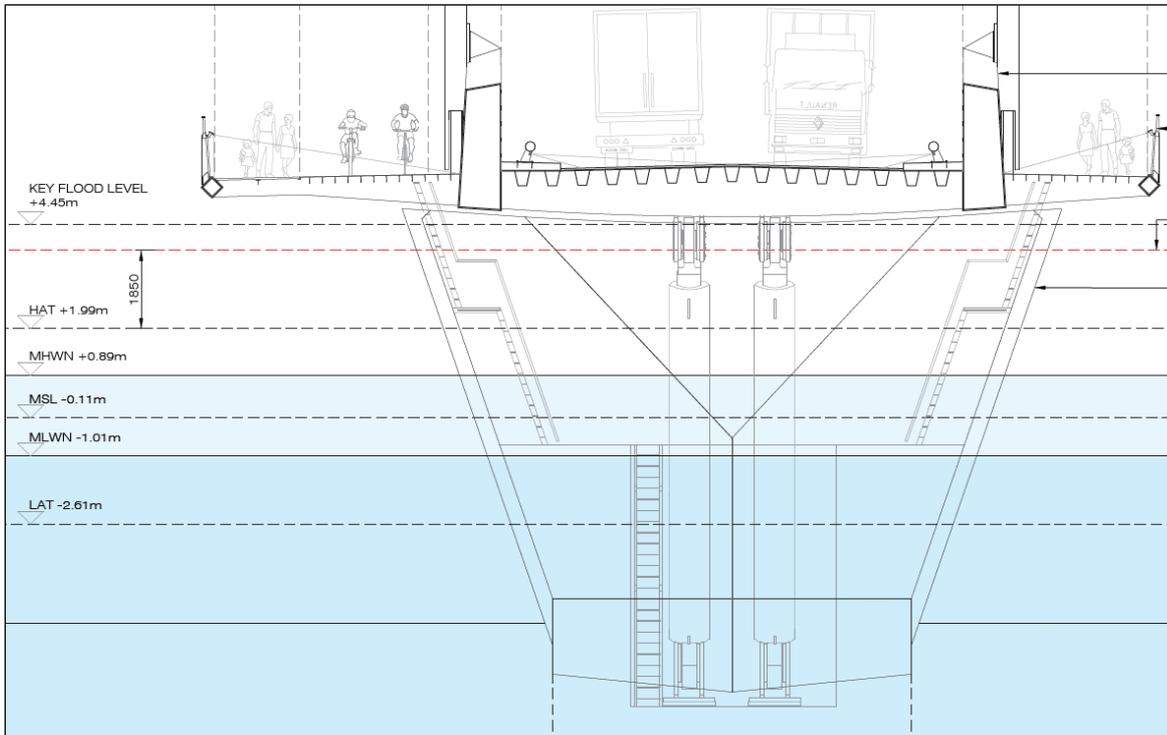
Extract from SPAR Bridge Typical Cross Section
